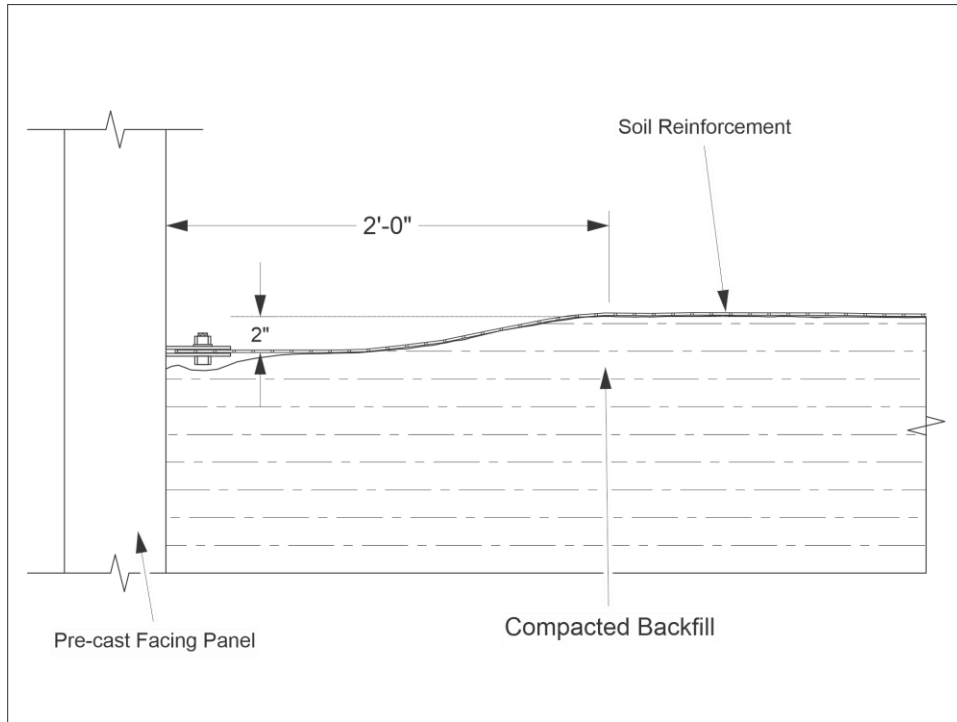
Recommended compacted backfill height relative to soil reinforcement connection to account for backfill settling shortly after construction
